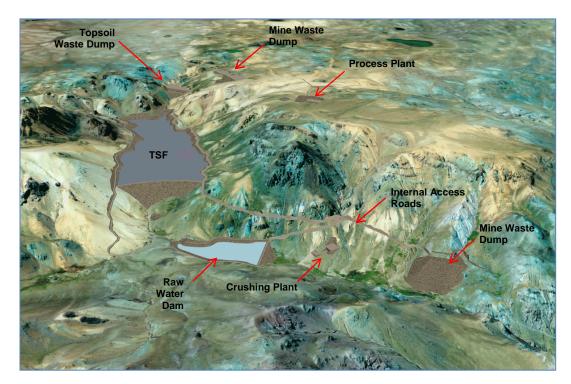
Tailings Storage Facility in relation to the Process Plant (looking east)
